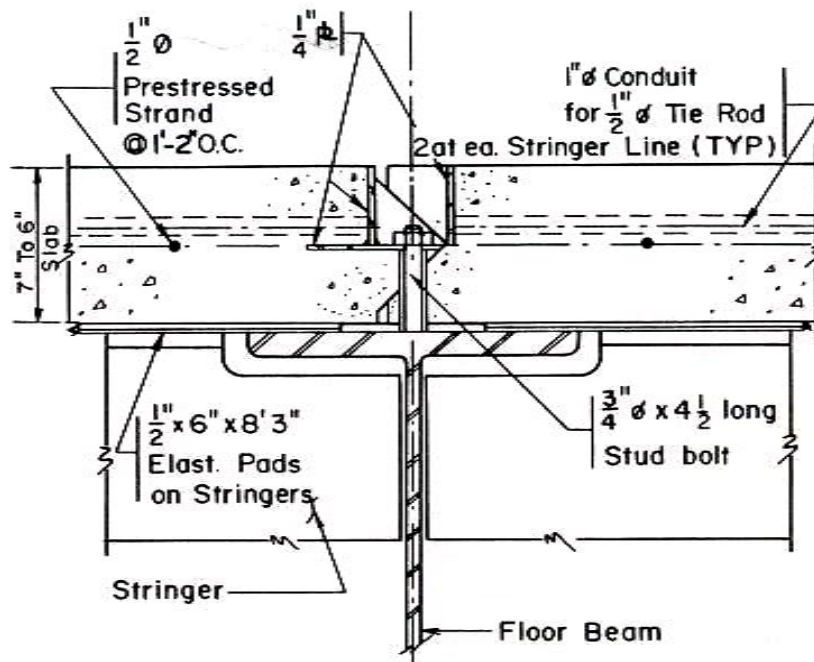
Joint details of the Rondout Creek Bridge
